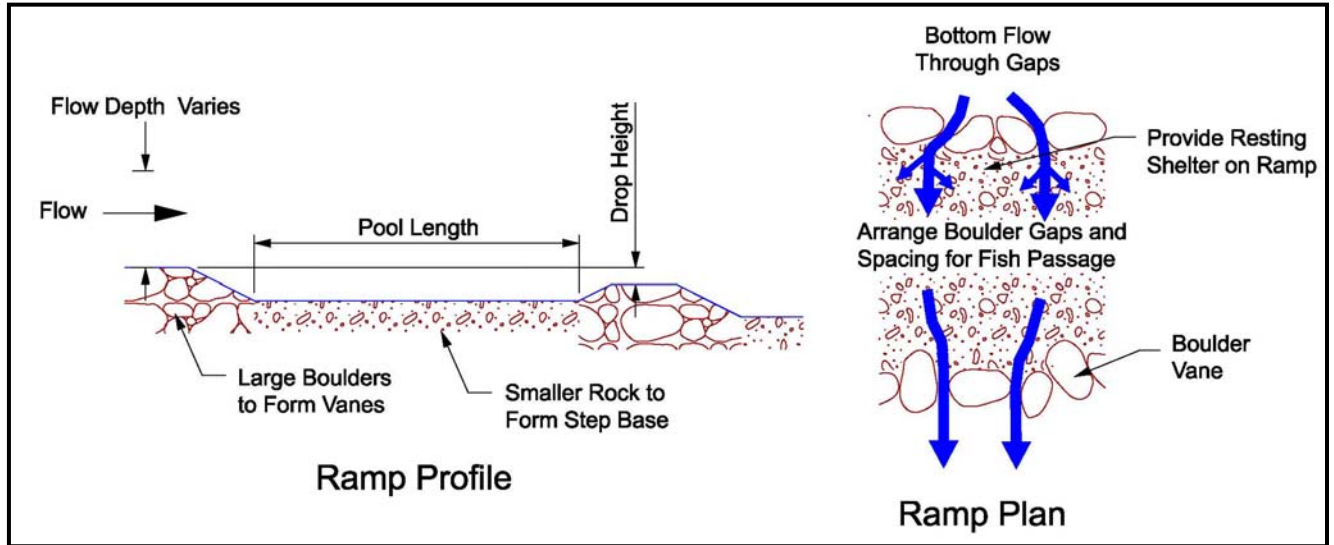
Conceptual Ramp Plan and Profile.
